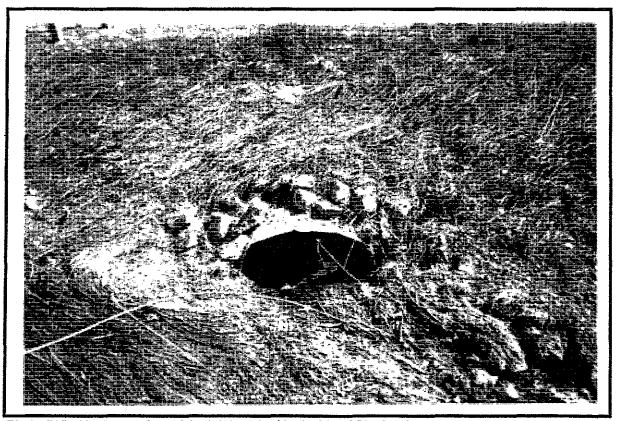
Upstream view of the inlet on the North side of Steeles Avenue.
